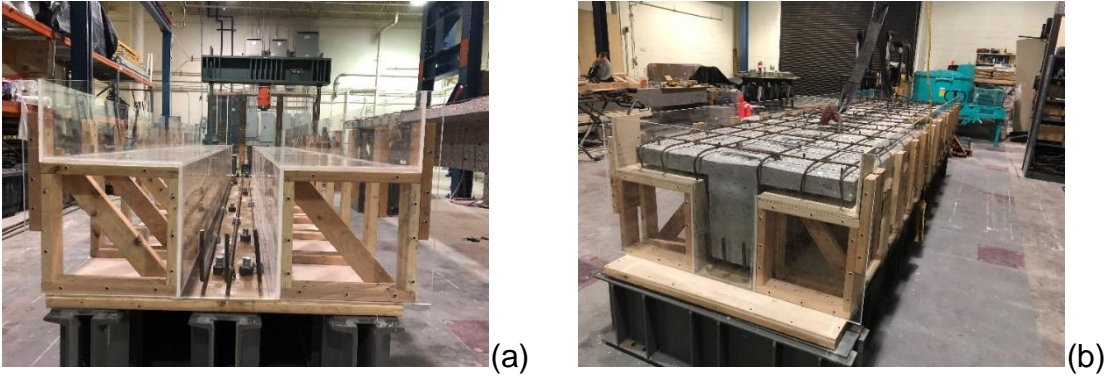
Construction of formwork for the UHPC repair: (a) The acrylic formwork; (b) Placement of additional reinforcing steel in the beam flange.
